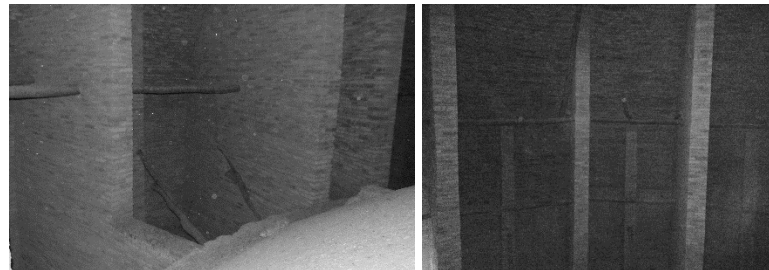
Stiffeners walls and wooden elements of the Double dome (photo by author, 2019)
